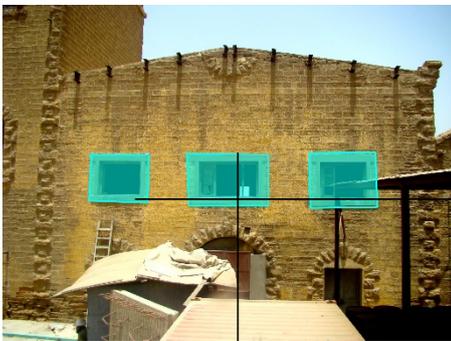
Later Addition, openings on Barrack A, south-east facade, 15 to 17A, East Wharf, KPT, Karachi.
